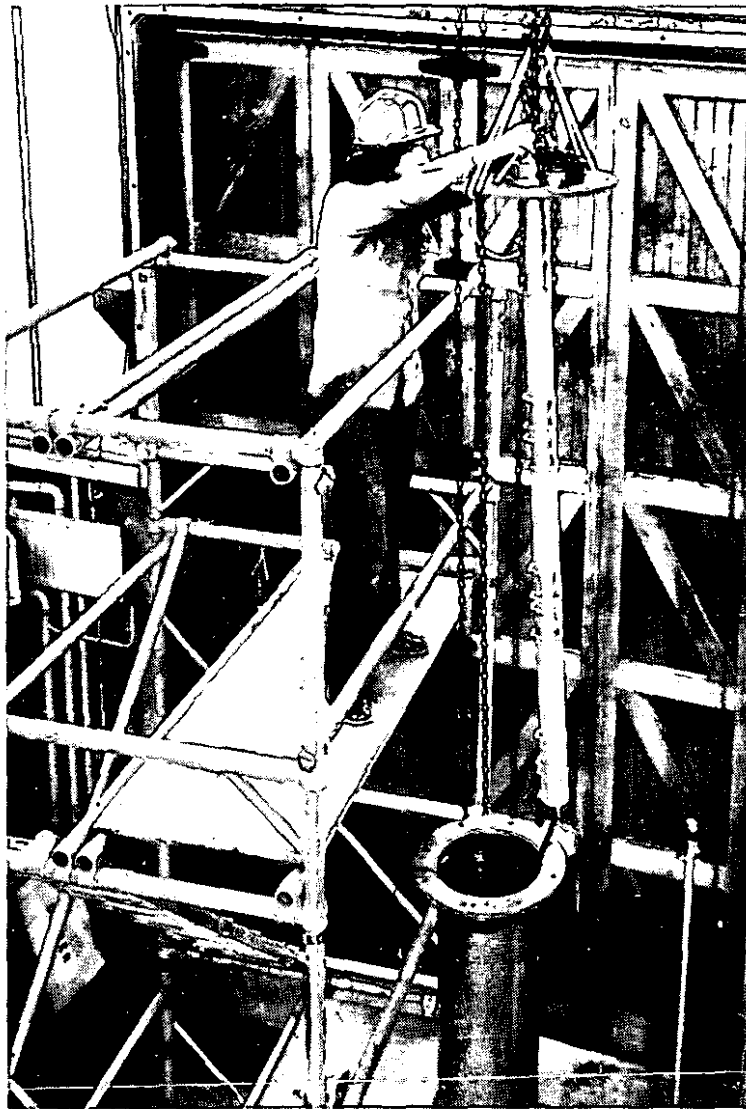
DIP TUBE ASSEMBLY OUTSIDE THE DUCT
